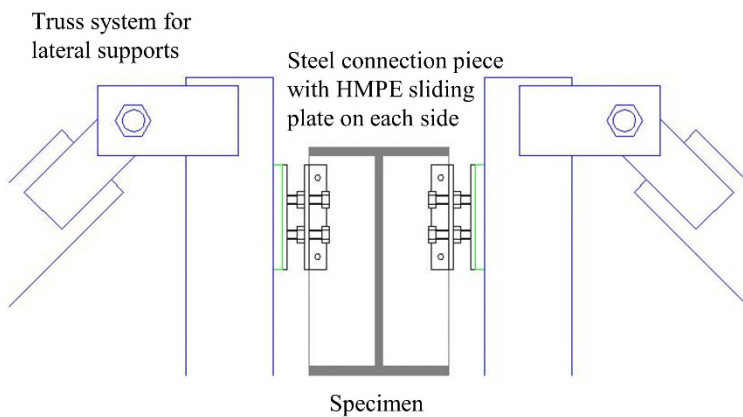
Lateral support with truss system, steel connection piece and HMPE sliding plate.
